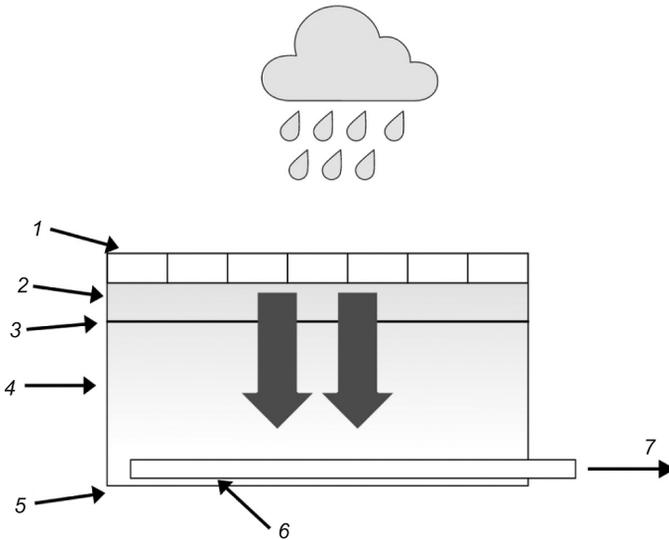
Permeable pavement (LEGGETT 2001): 1 – permeable surface; 2 – bedding layer; 3 – permeable geotextile; 4 – permeable sub-base with storage voids; 5 – for attenuation: robust welded geo-membrane; 6 – collection pipe network; 7 – rainwater to further treatment, storage or directly to re-use
